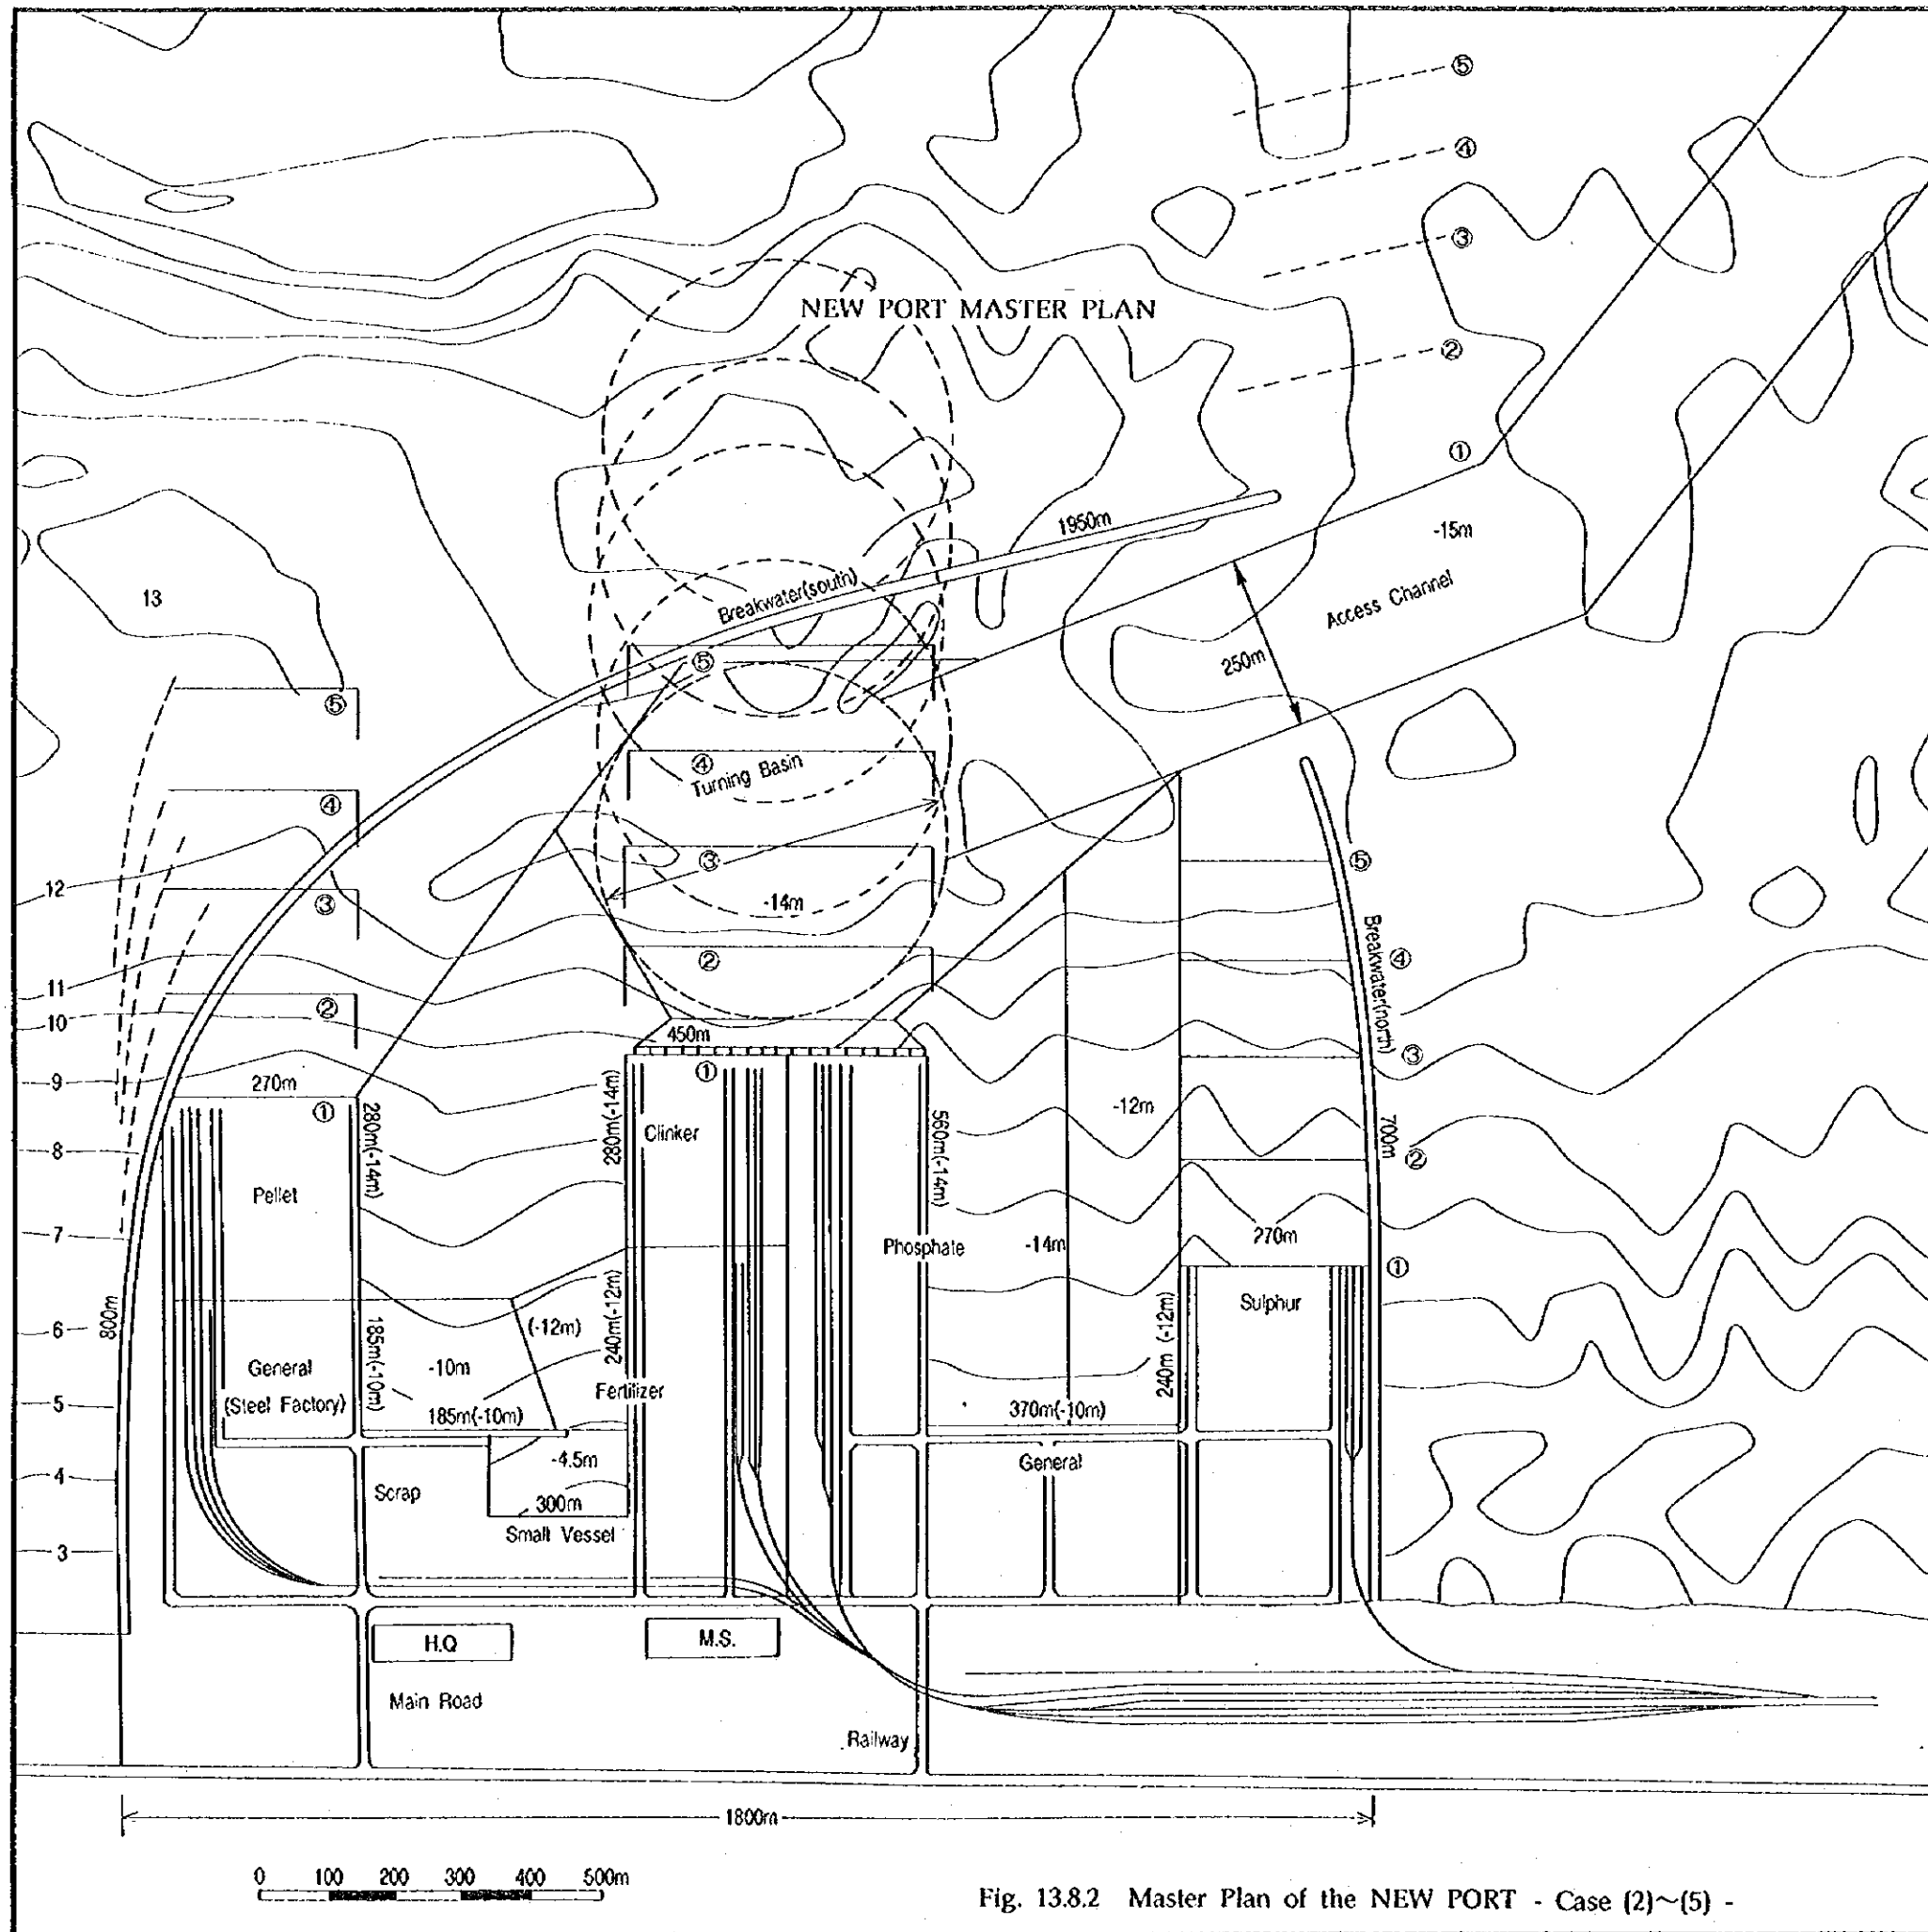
Master Plan of the NEW PORT - Case (2)~(5) -
